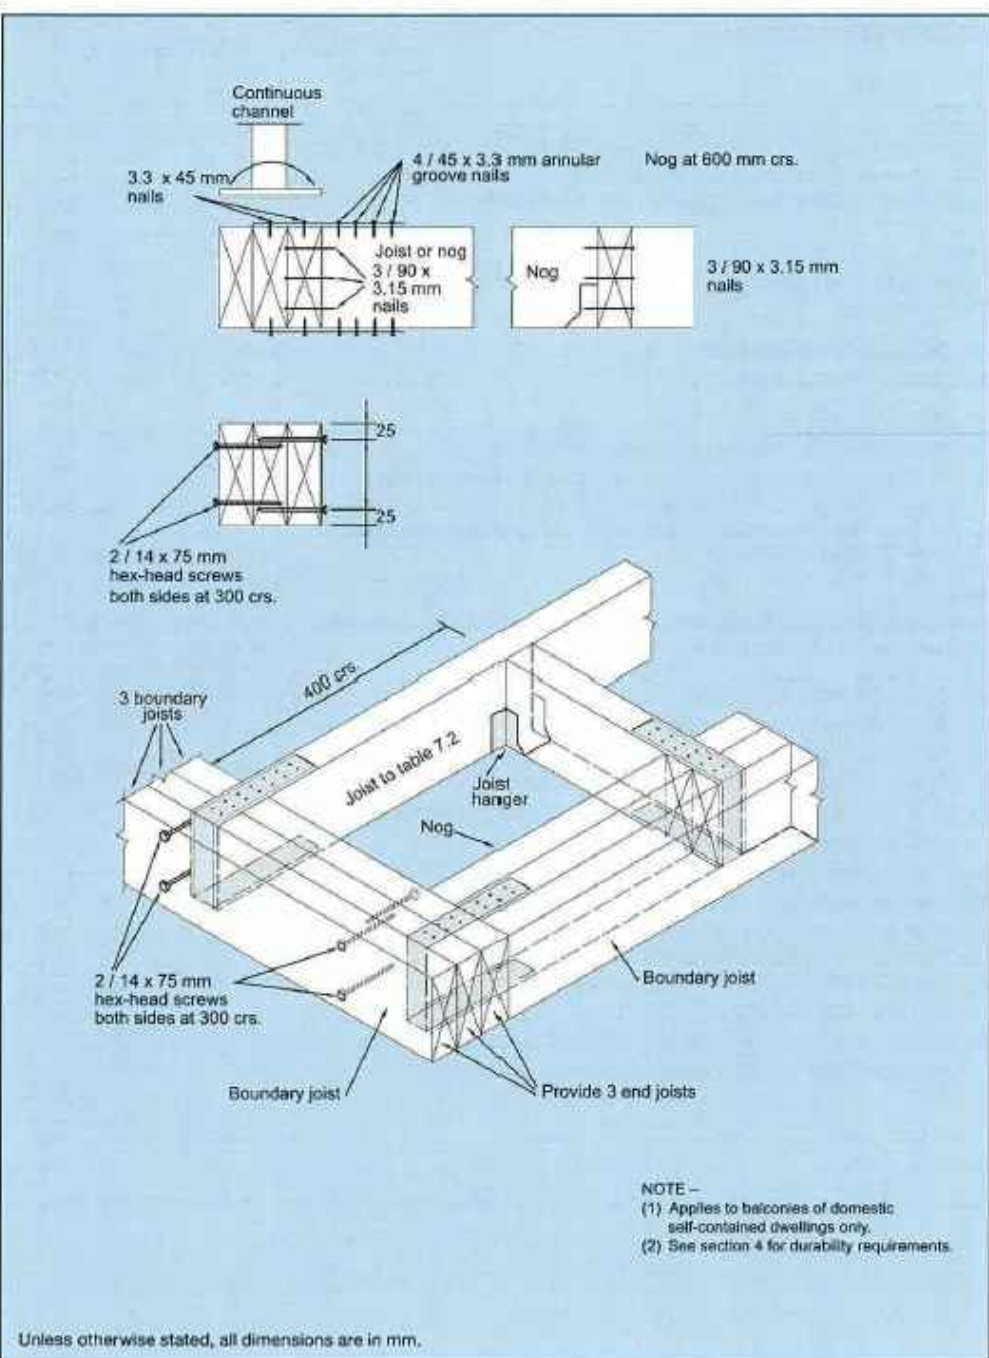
(a) – Continuous channel support detail for cantilever balustrade (see 7.4.1.3)
